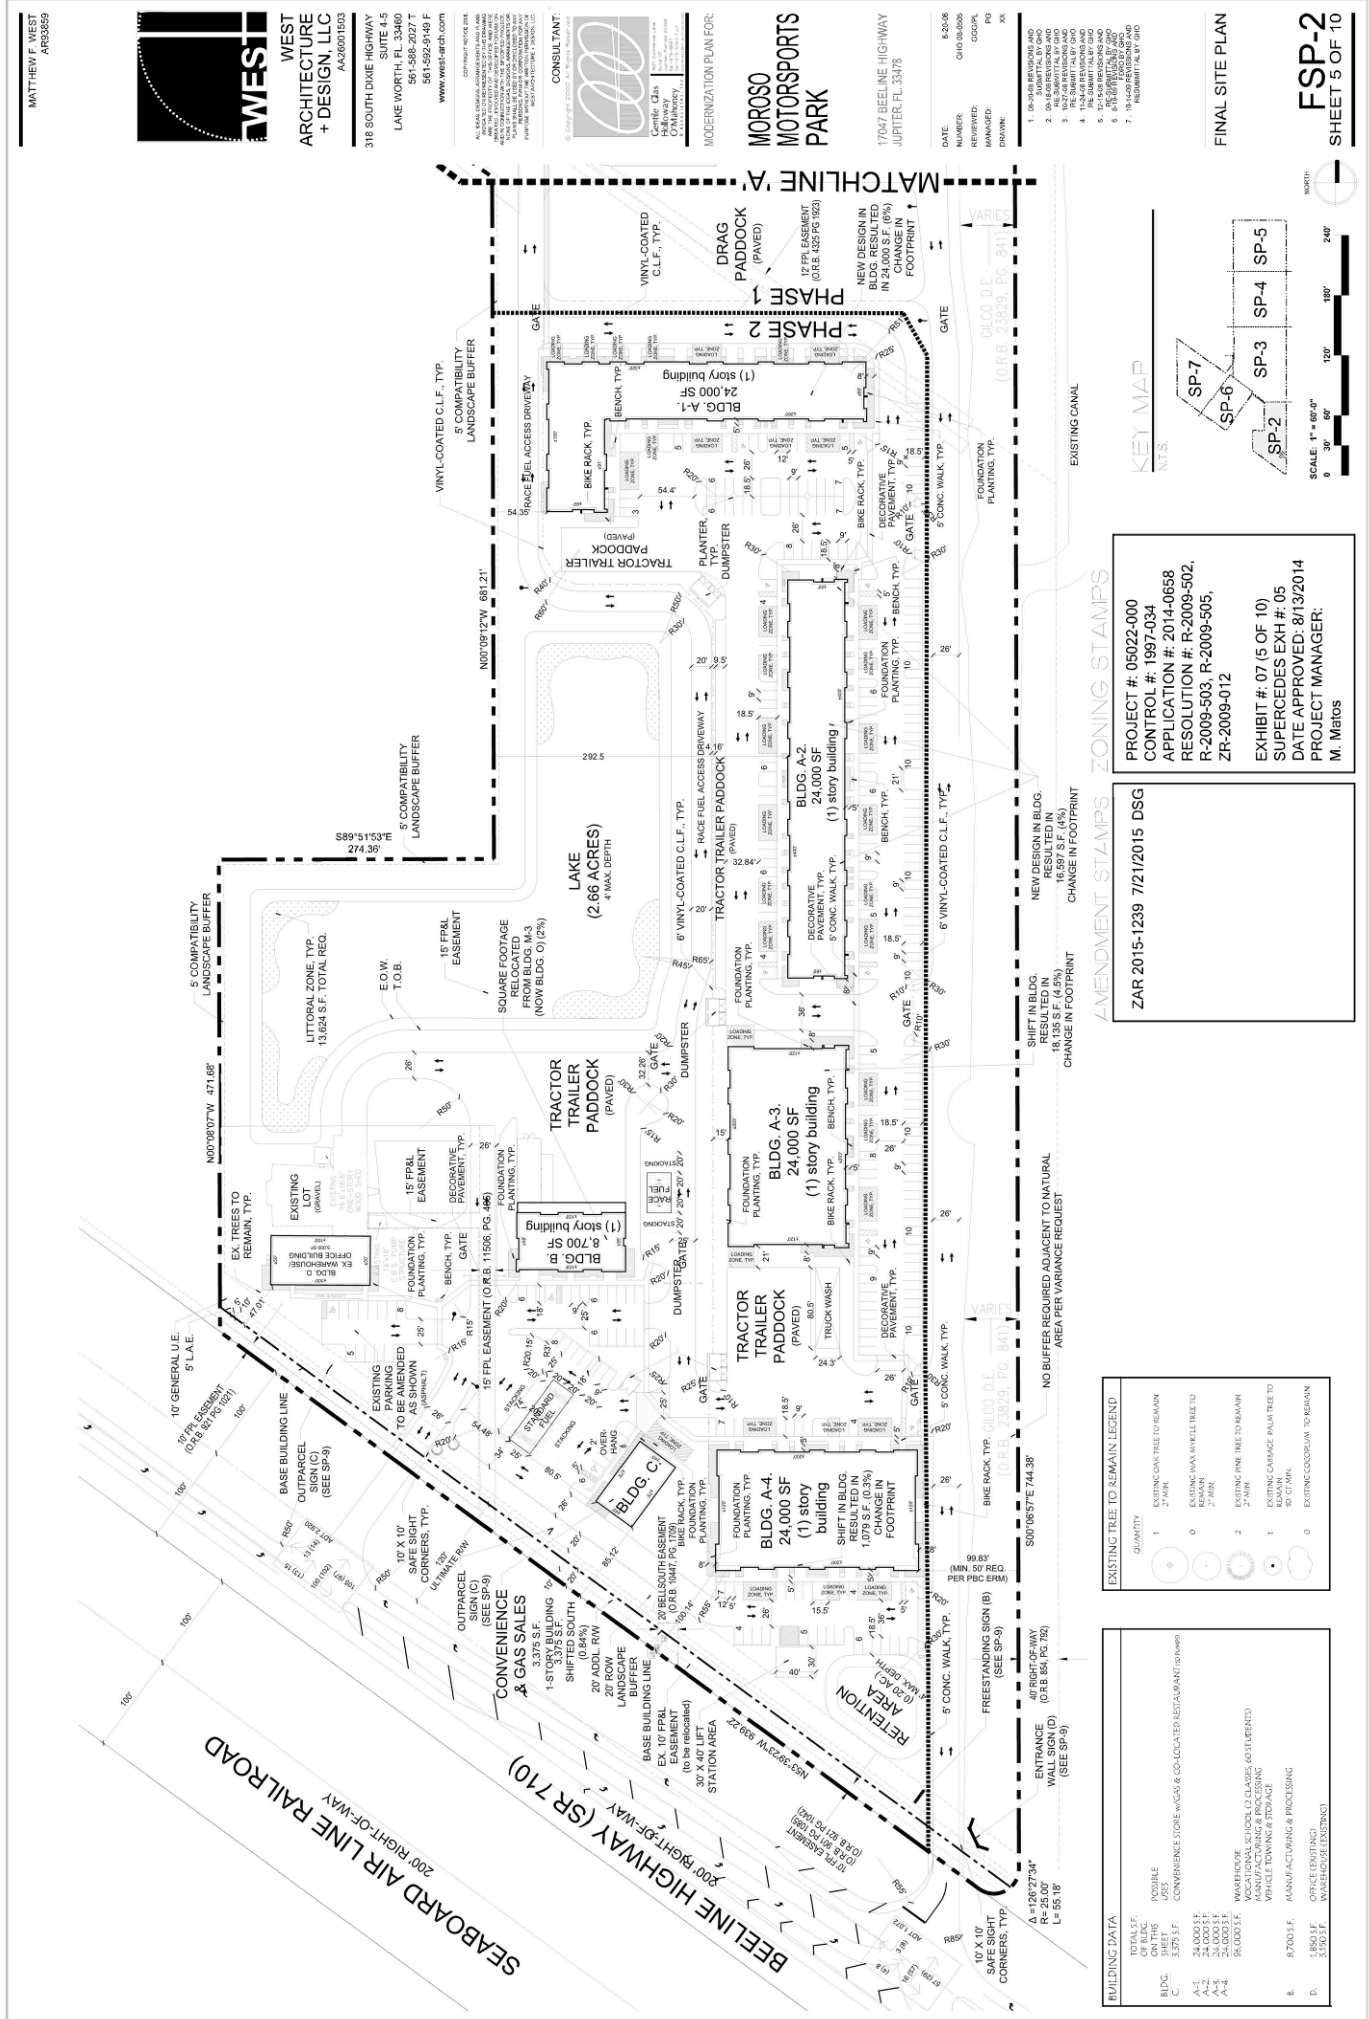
Previously Approved Final Site Plan (FSP-9 of 10) dated July 21, 2015
